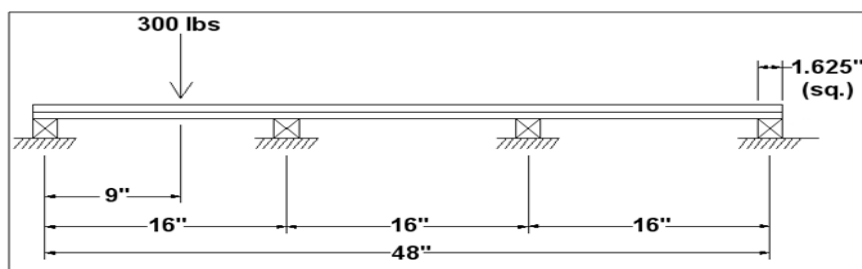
Cross-sectional view of the test specimen assembly of the Robinson-Type Floor Tester (ASTM C627).
